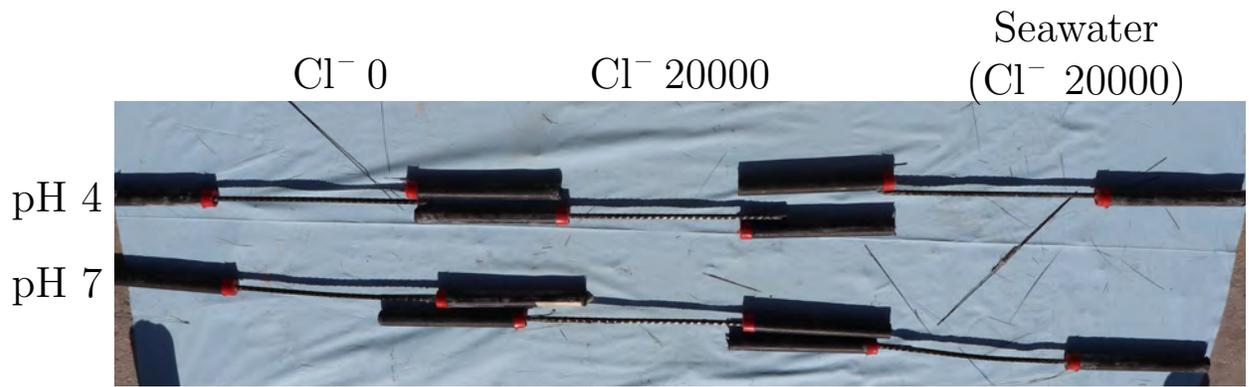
Tensile test failure mode of Type C # 3 rebar
